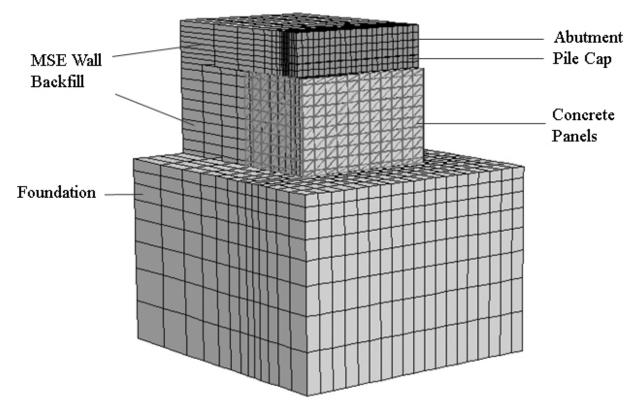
Numerical model of the mesh representing the Telegraph Road bridge abutment. The figure displays the concrete abutment, elasticized EPS, abutment and foundation soil, and the MSE wall elements. The rest of the elements have been omitted for clarity.
